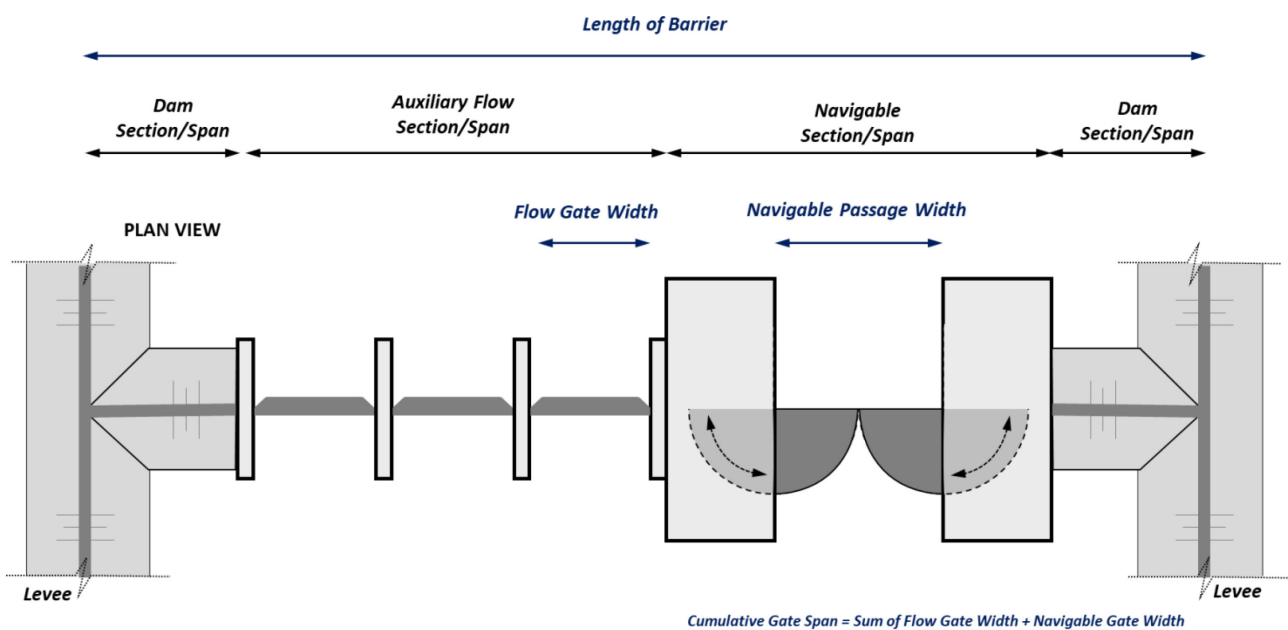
A hypothetical storm surge barrier layout in plan view with gates in the closed position.
